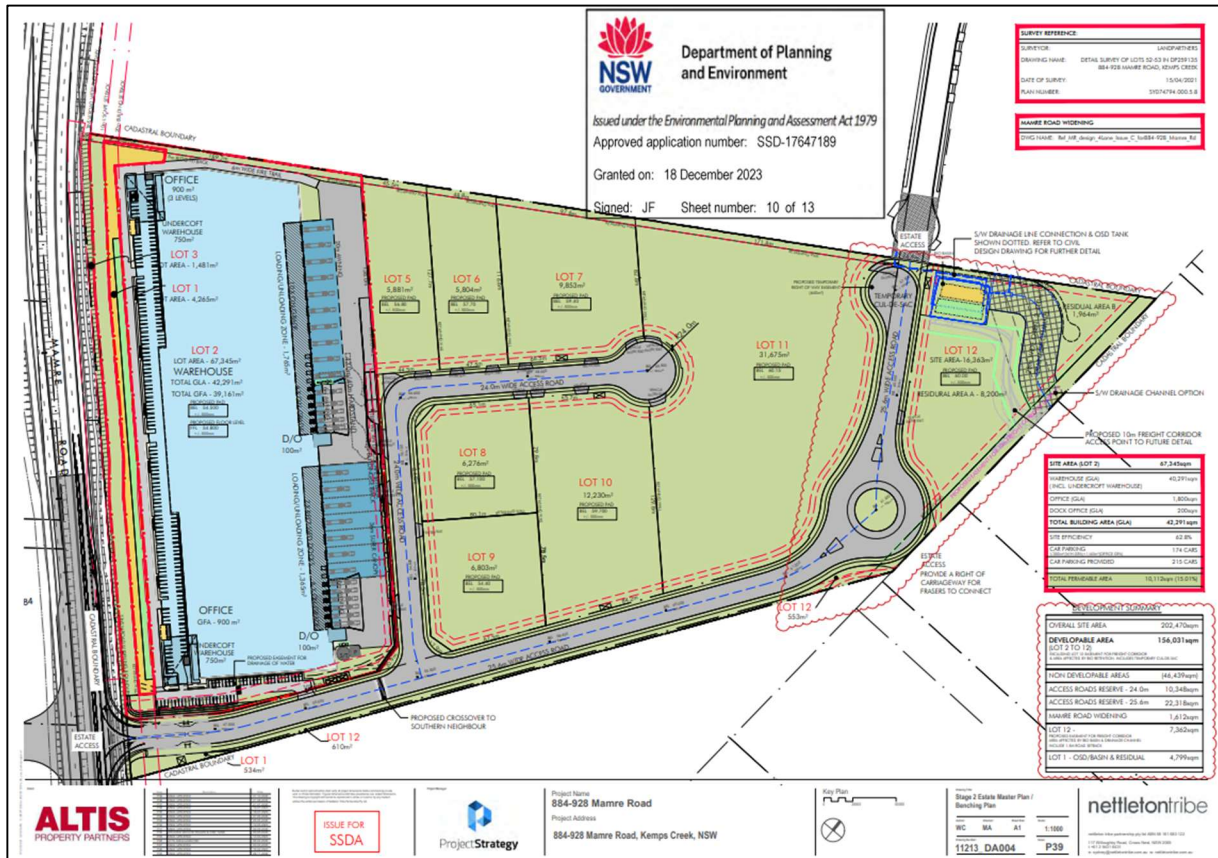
Approved Estate Site Plan (Source: Nettletontribe Architects, 2023)
